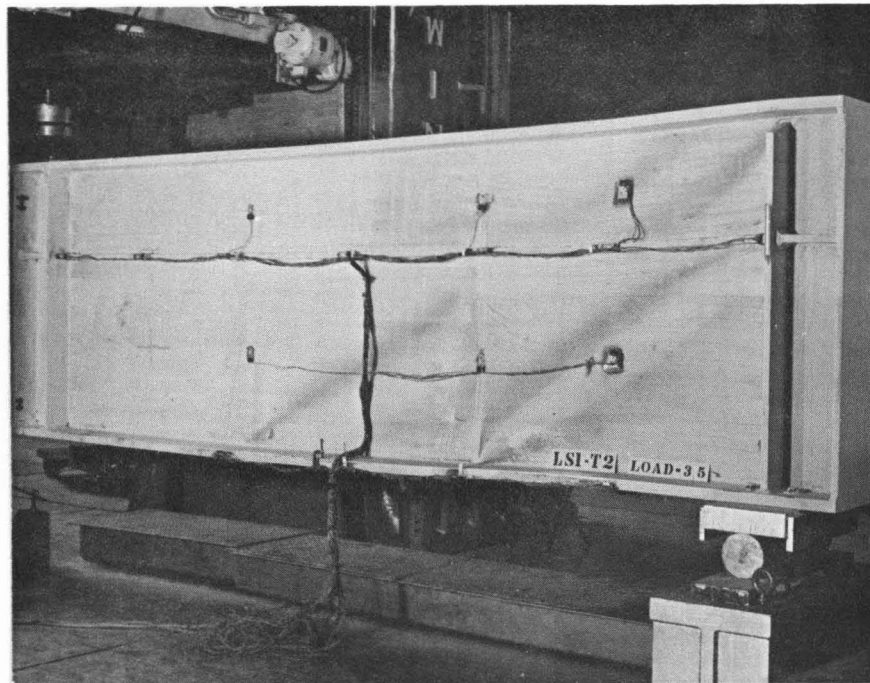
Appearance of Girder LSI at Load No. 35
